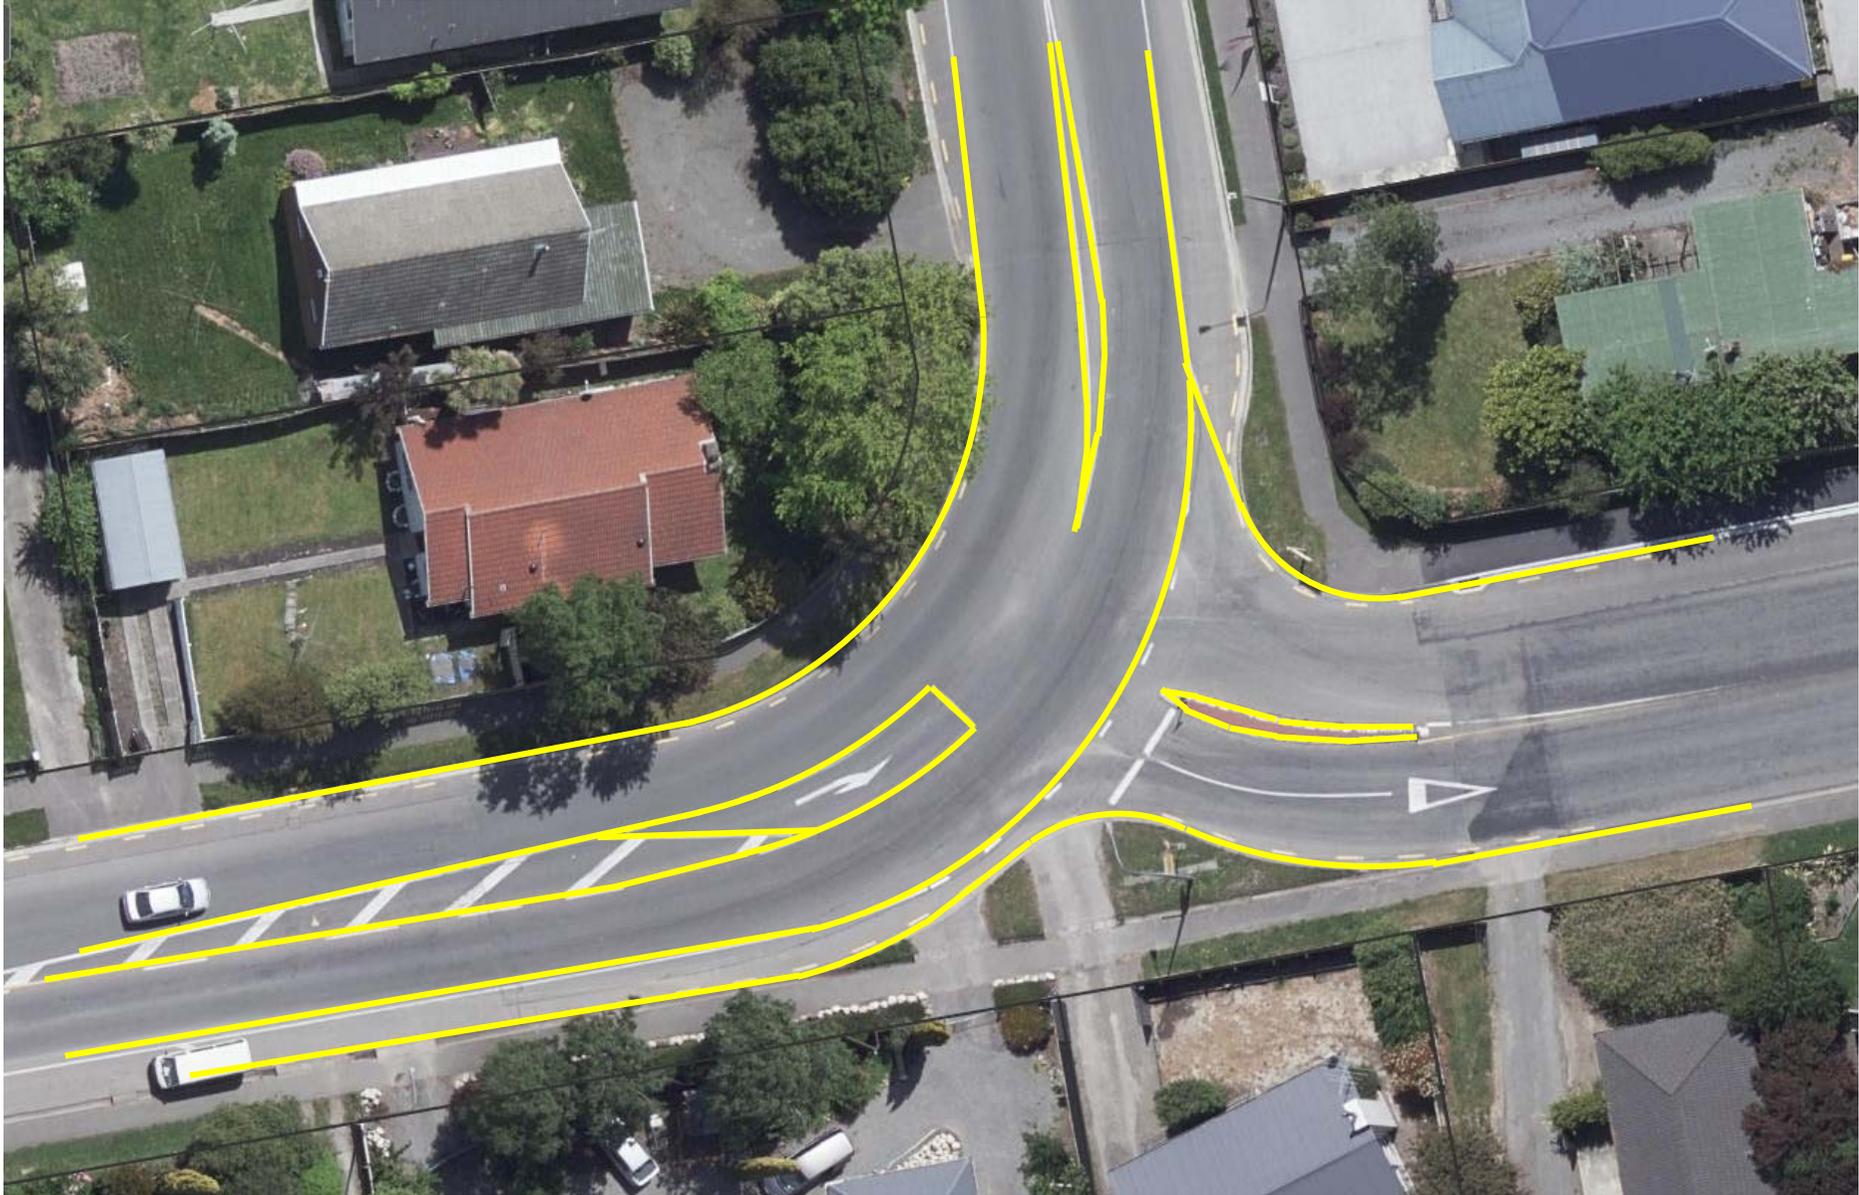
Ivory Street / Northbrook Road Intersection, Rangiora with Carriageway Markings Traced in Yellow
